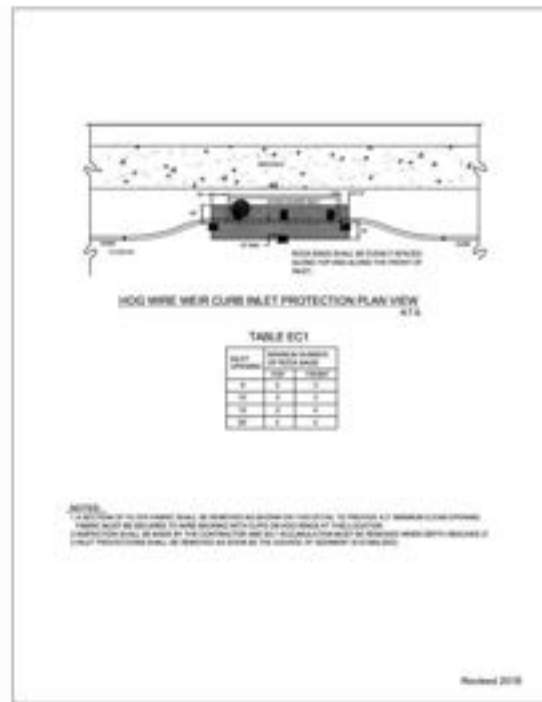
Hog Wire Weir Curb Inlet Protection
